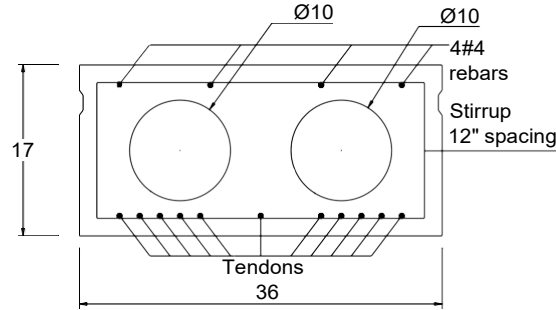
Cross section of prestressed concrete box girders of CR 30 Bridge over Tom Creek, WV
